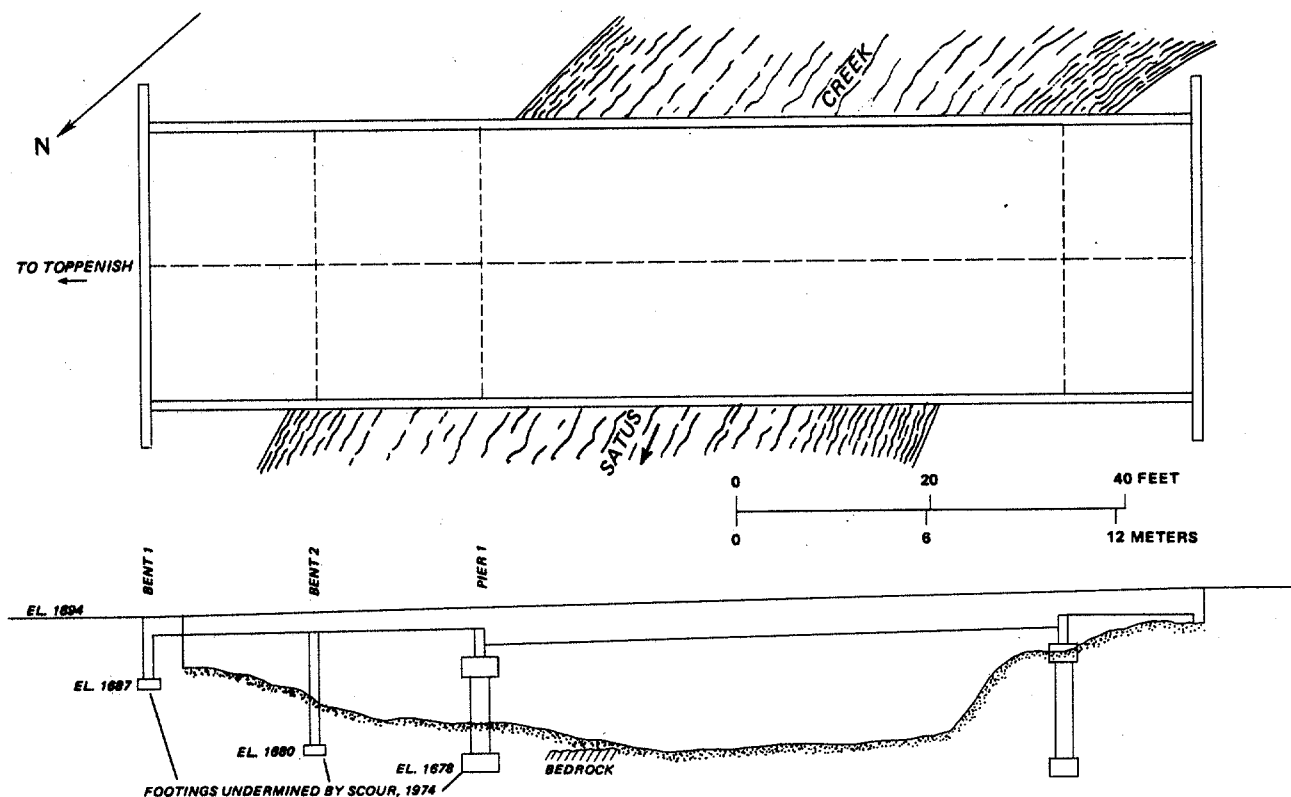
Sketch of plan (top) and elevation (bottom) for bridge at fourth crossing of Satus Creek.
